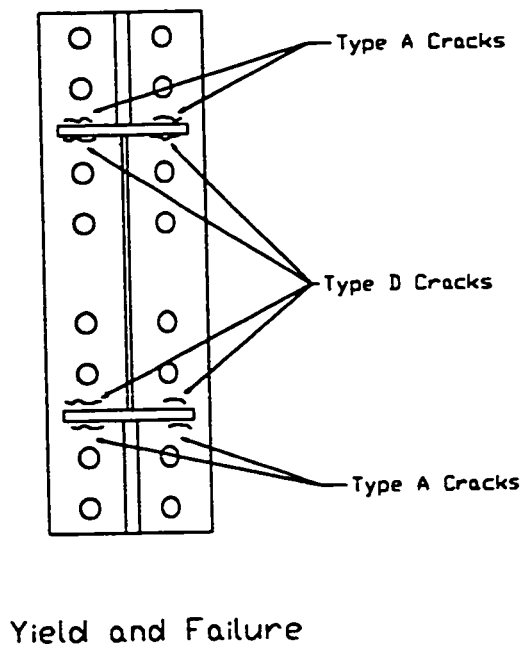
Crack Locations at Yield and Failure for Connection M-4
